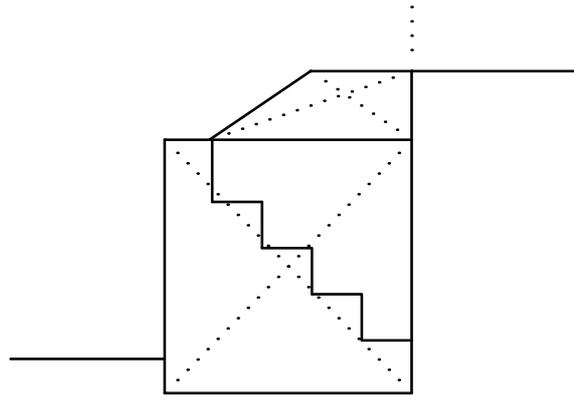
ELEMENTS OF A GRAVITY EARTH RETAINING STRUCTURE
